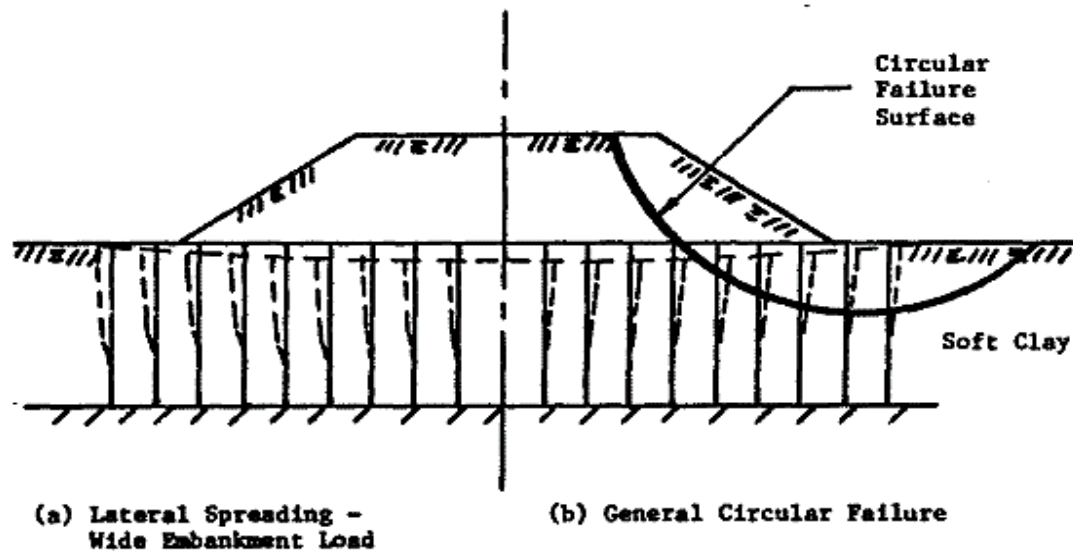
Failure of stone column supported embankment (Barksdale and Bachus 1983)
